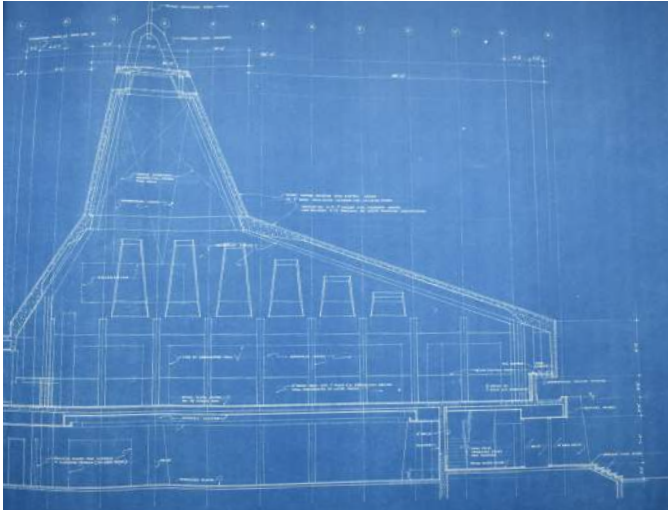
Section at Building A showing continuous concrete roof structure (T. V. Murray, 1963).
